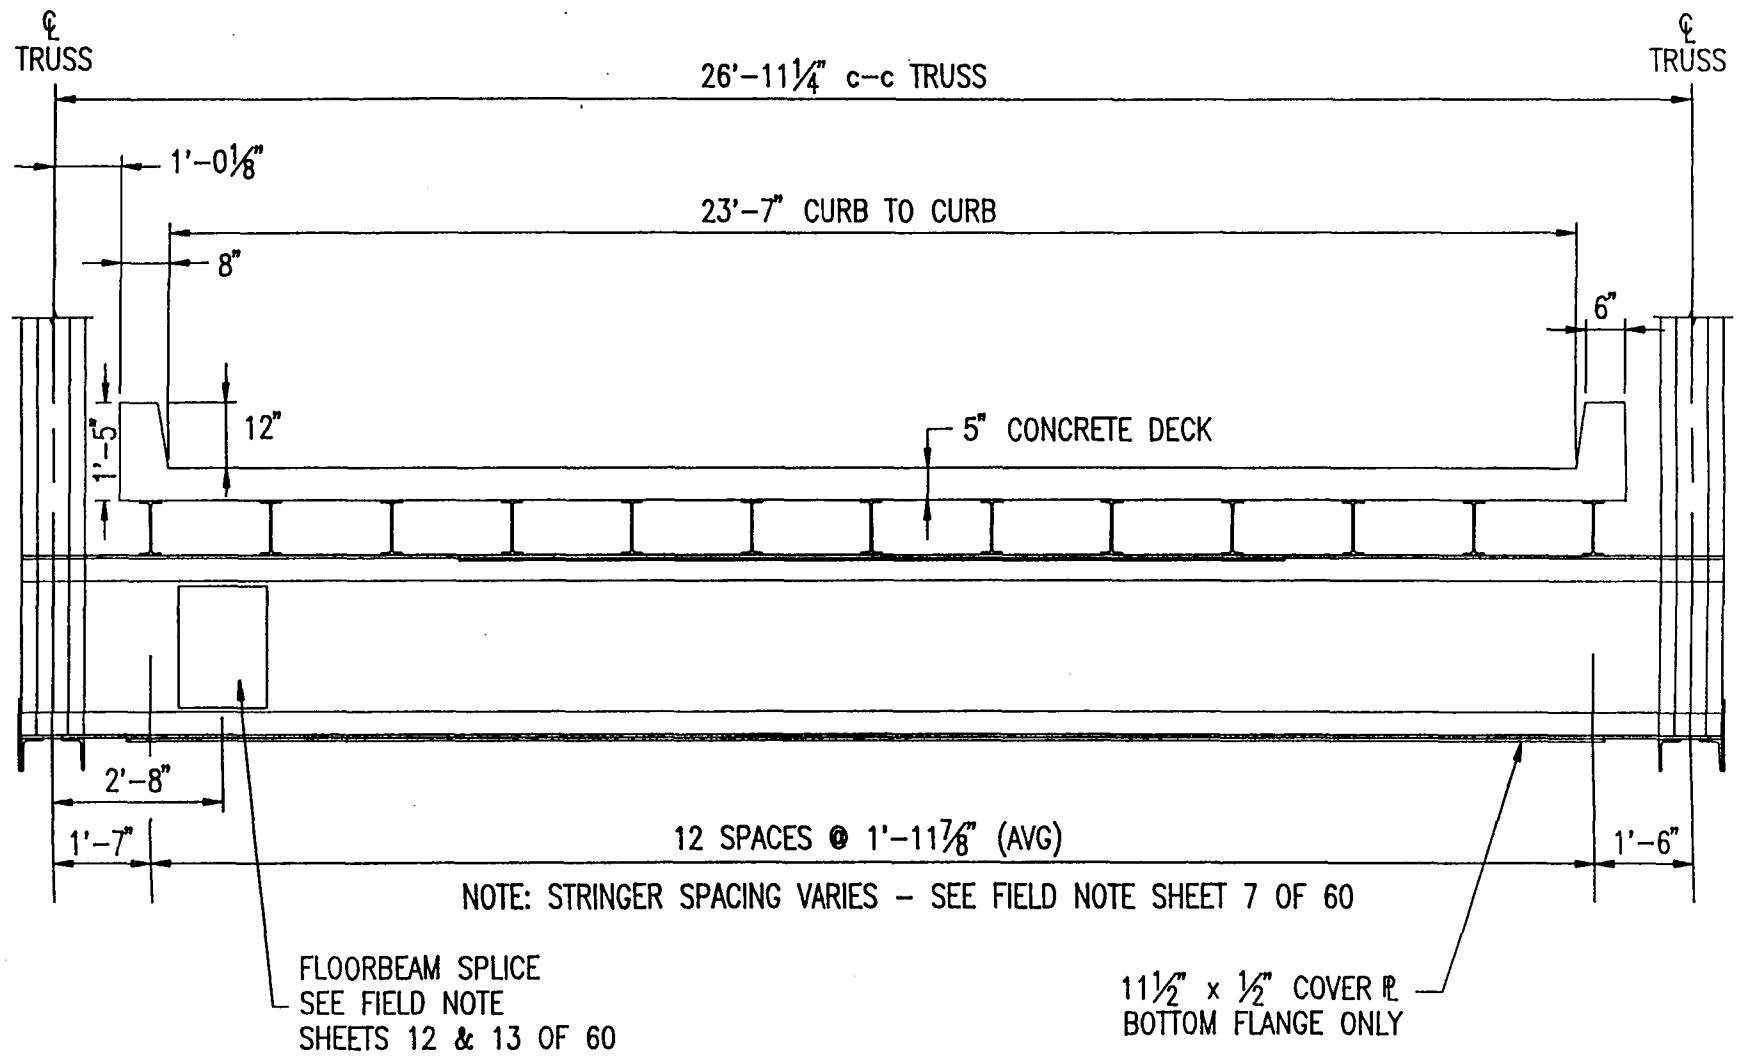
Cross Section at Cedar Bluff Truss Span
